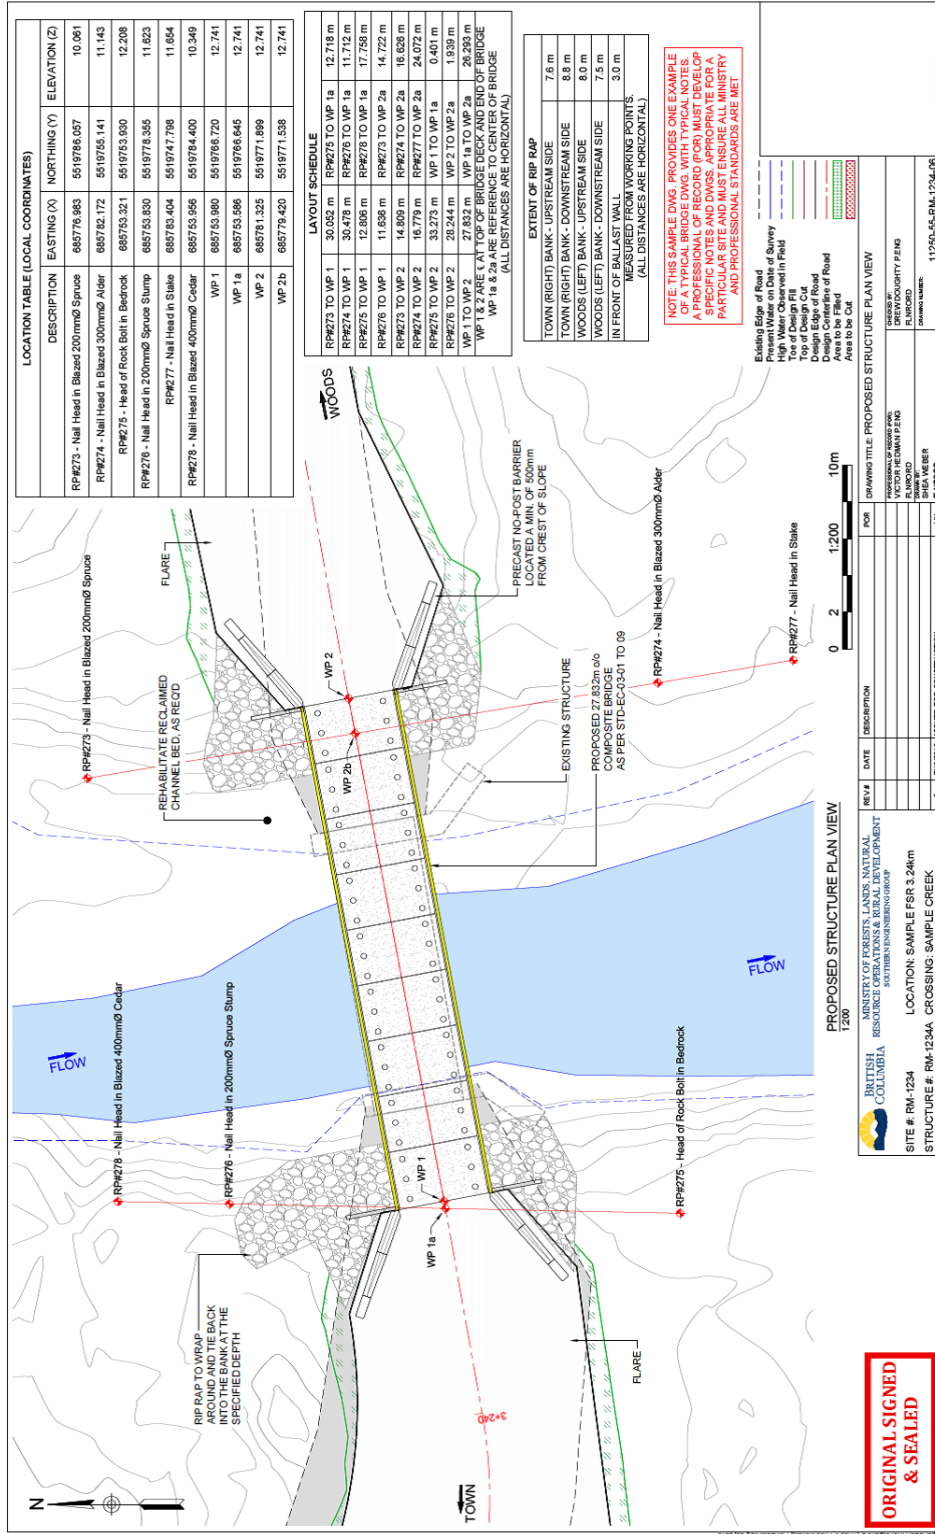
Sample of General Arrangement and Layout (complex creek crossing) (PDF, 2.2 MB)
